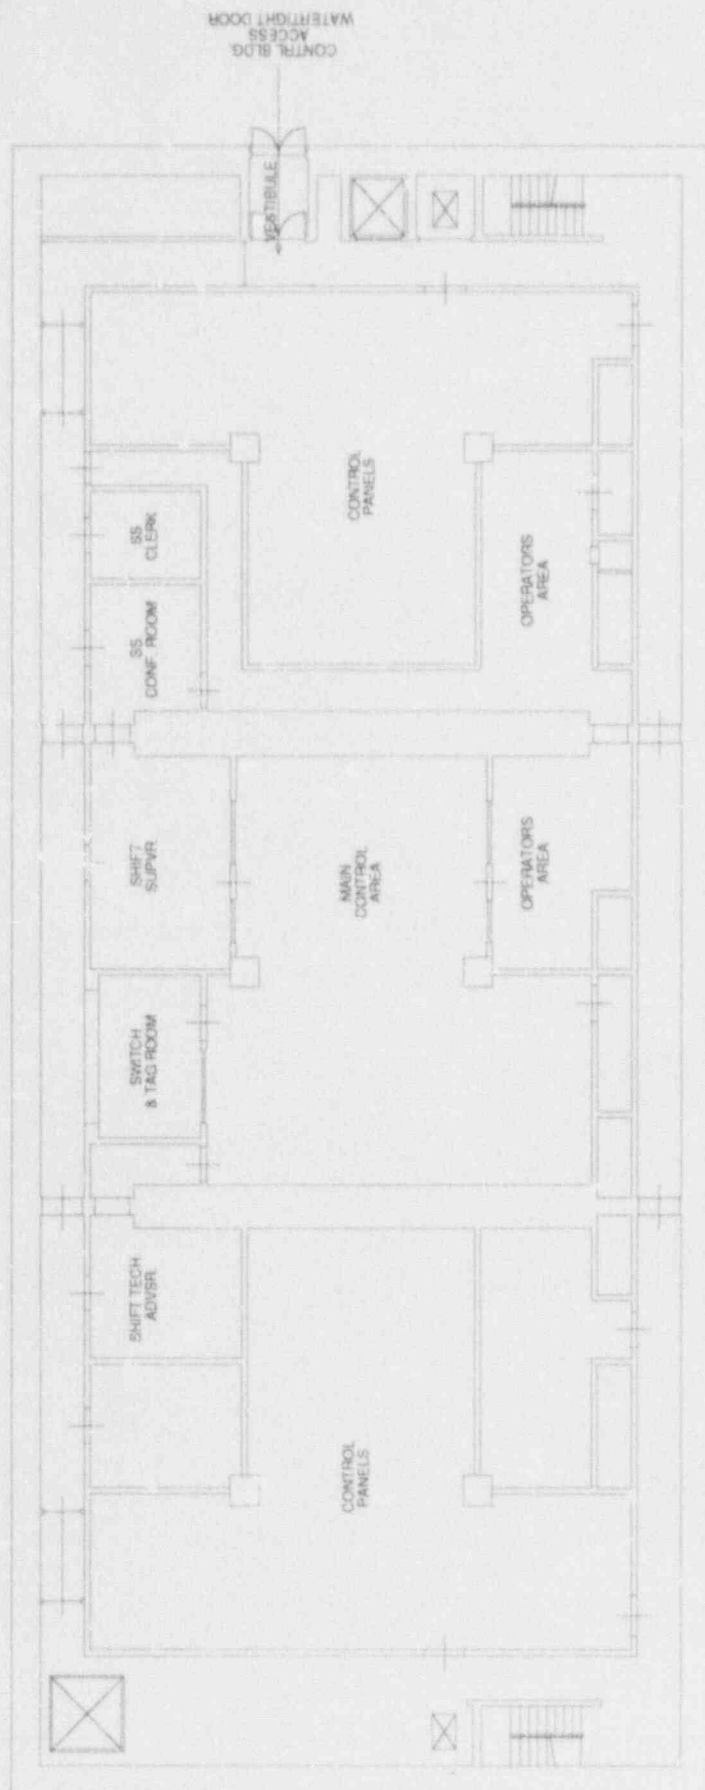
CONTROL BUILDING FLOOR B2F
